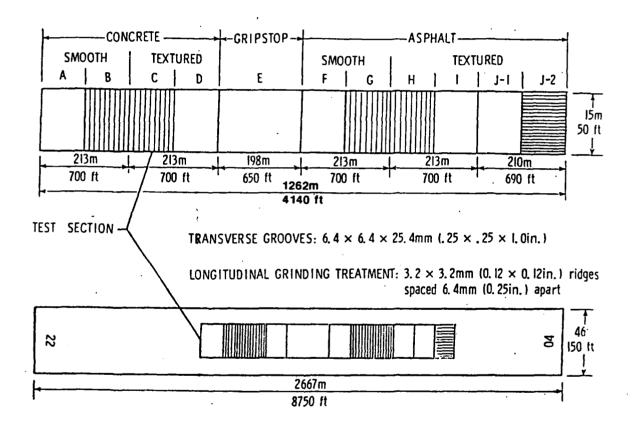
SCHEMATIC OF RUNWAY 4-22 TEST SURFACES AT NASA WALLOPS FLIGHT FACILITY
